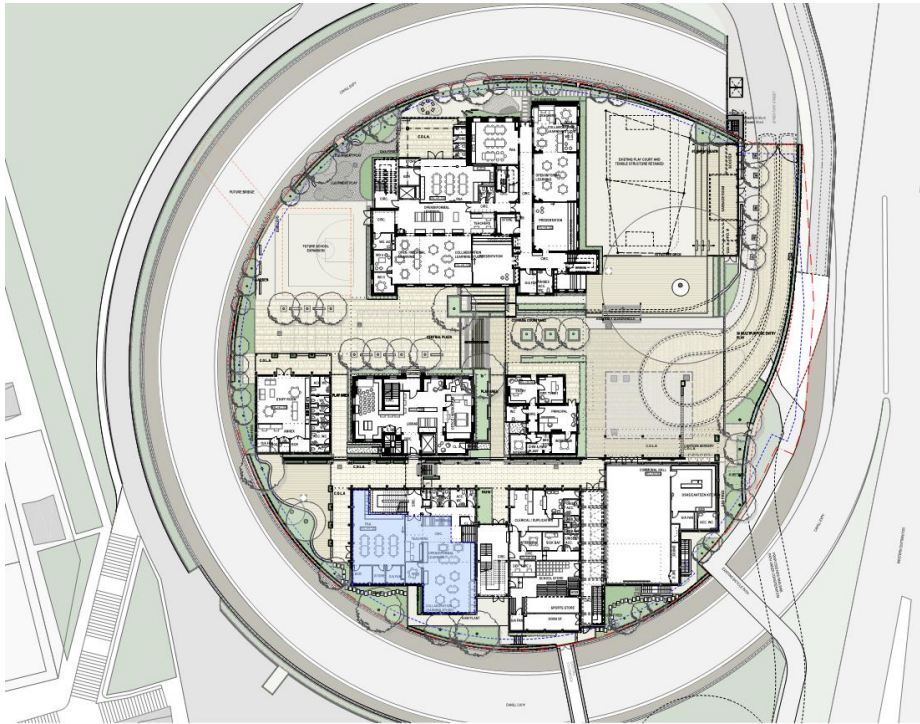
Proposed Plan – Ground (fjmt, 06.12.19)
